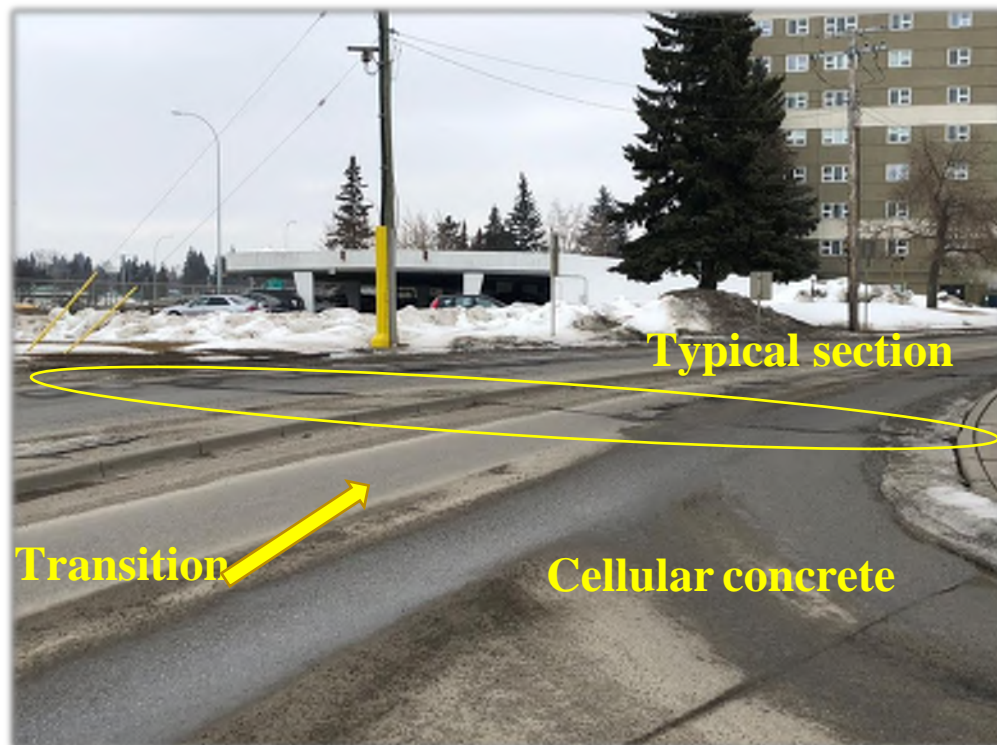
Pavement Distresses on the non-LCC section – 2 (CEMATRIX, 2018)
